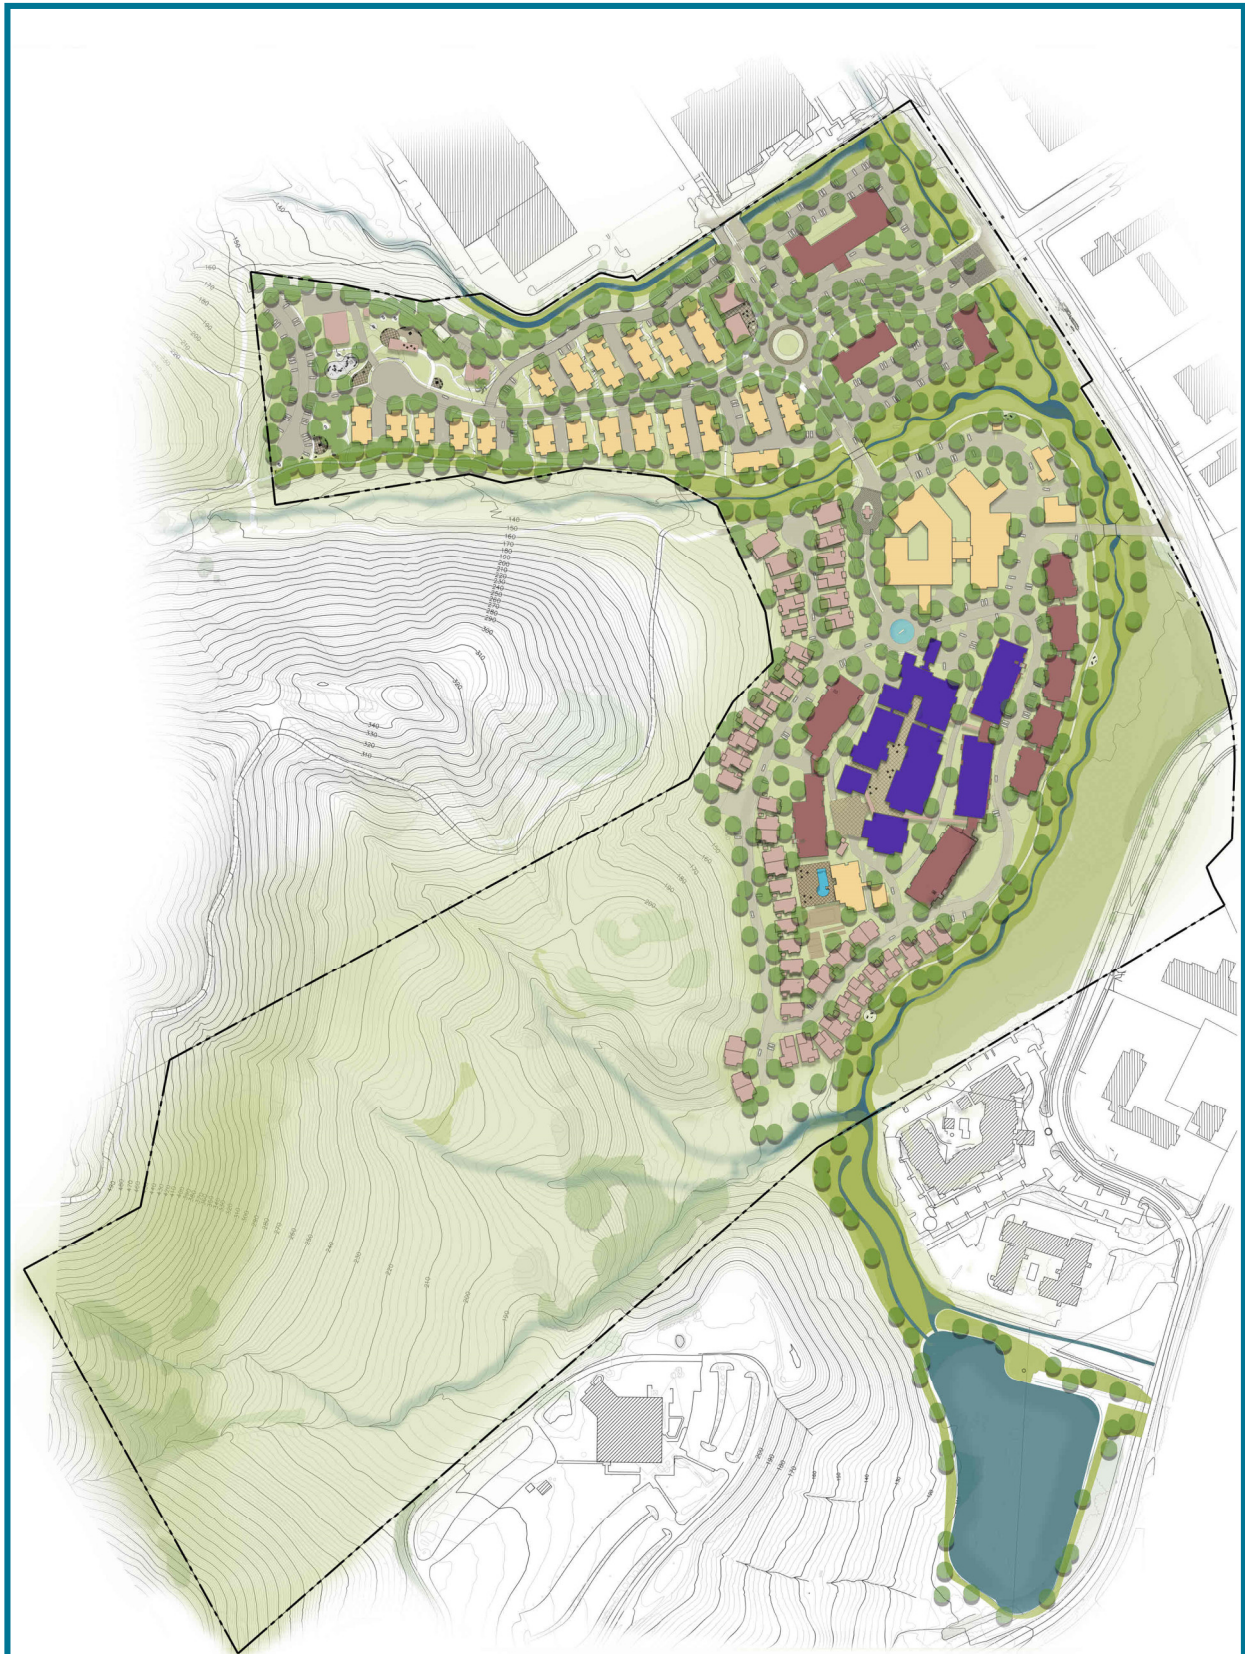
Froom Ranch site plan concept (RRM Design Group)
